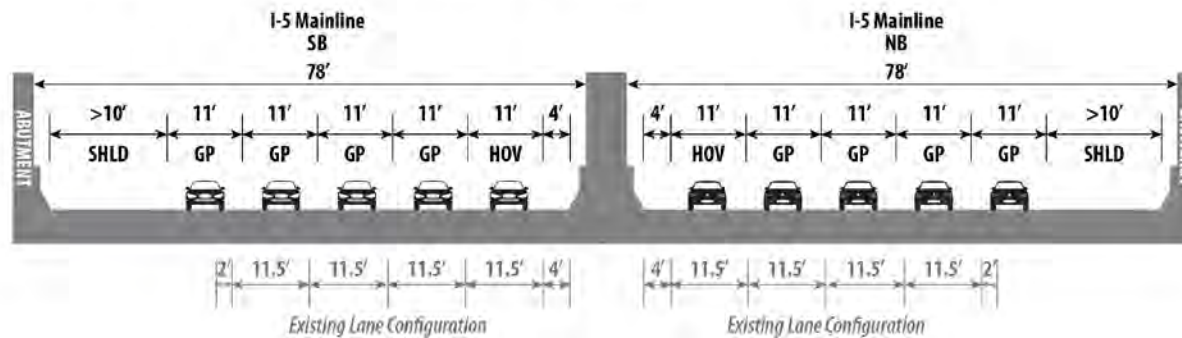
I-5 Practical Design Cross Sections at SR 512 and S 56th Street Bridges
